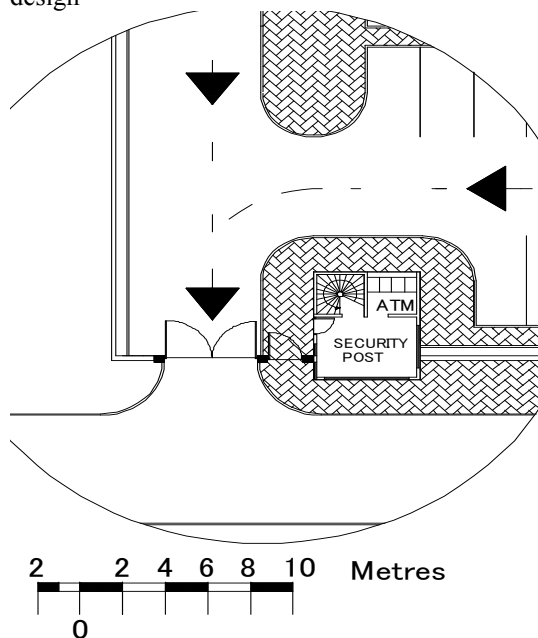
infrastructural Detail at B (PLAN). Source: author's design
